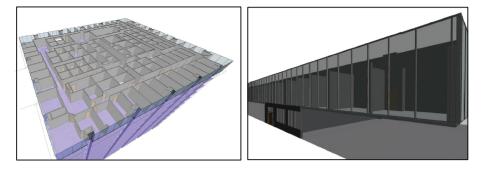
3D modeled in Revit views of the FinCo facilities used in study illustrating the base geometry elements to construct the BIM models. Facility A (left) shows a top view into the occupied floor and Facility B (right) shows the front façade.
